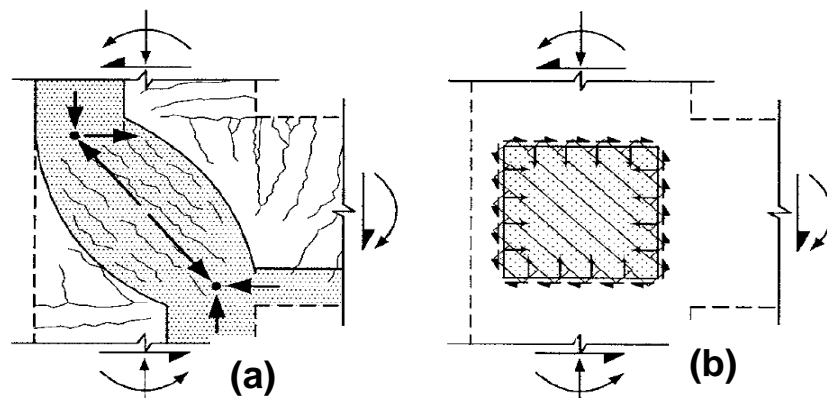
a) Joint diagonal strut mechanism b) Joint truss mechanism
